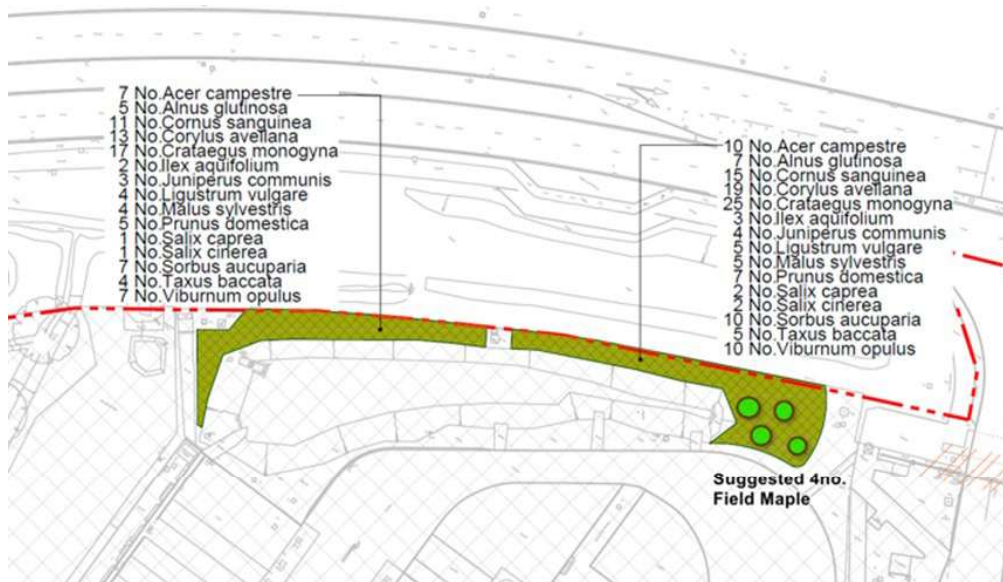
Detailed Planting Sheet 2 with my annotations of additional planting
